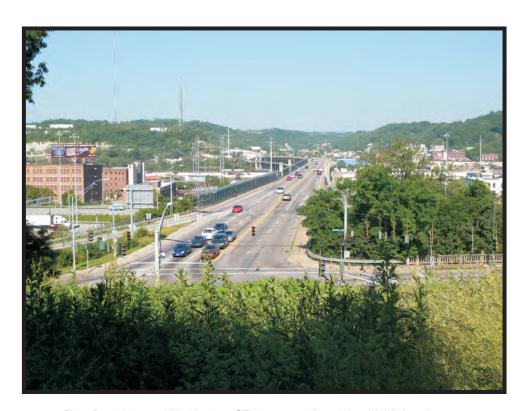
Western Hills Viaduct (SFN 3105458) from West McMicken Avenue, facing west.
